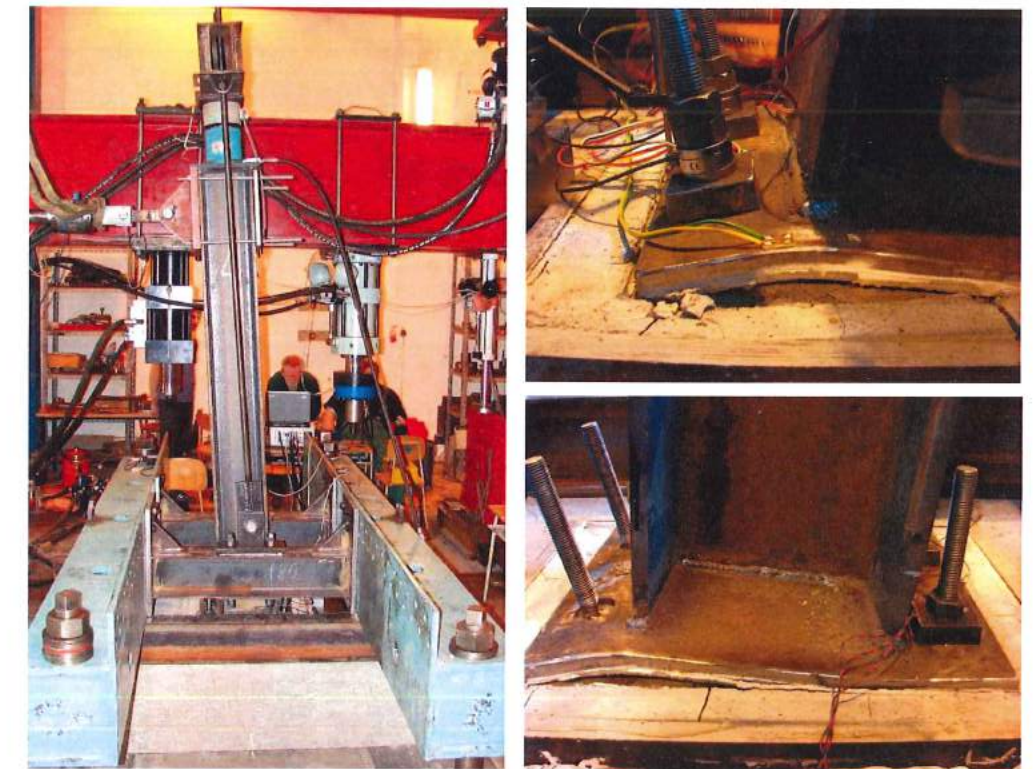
Test set-up and deformed base plate and anchor bolts
